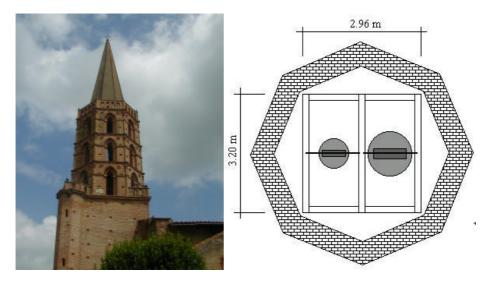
Bell-Tower of the Church of Finhan (Tarn-et-Garonne)
